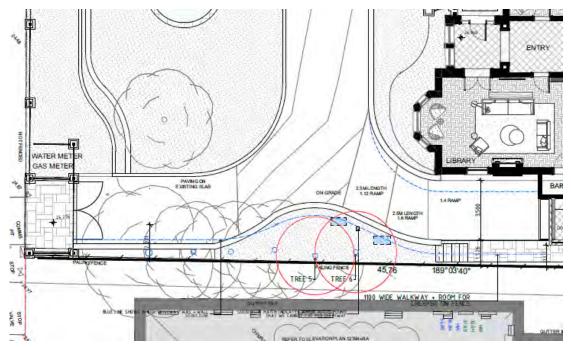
Location of basement ramp with blue dashed line showing previous ramp location (S57A amended plans) (Source: Applicant)
